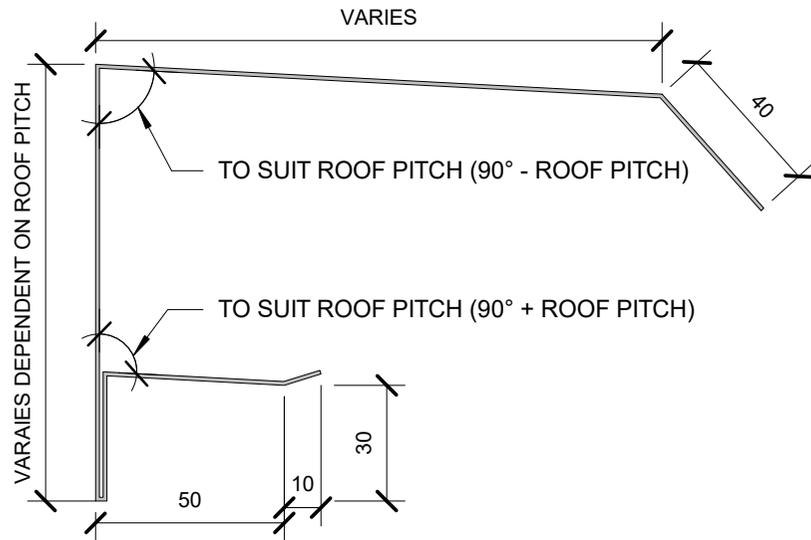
DETAIL RECOMMENDED WHERE ROOF RUNS EXCEED 16m
